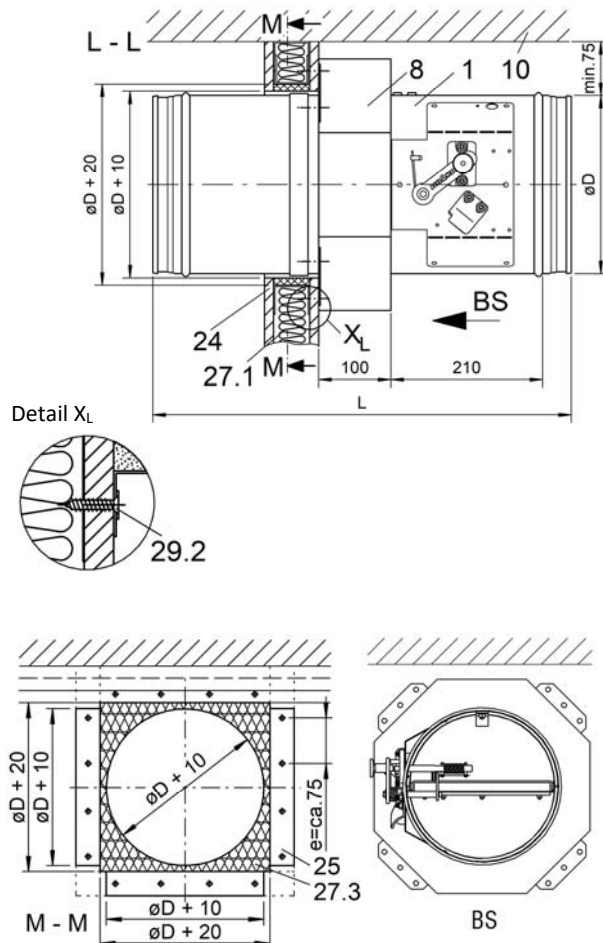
Dry installation on lightweight partition wall with mounting frame AR (F30/F60) under solid ceiling
